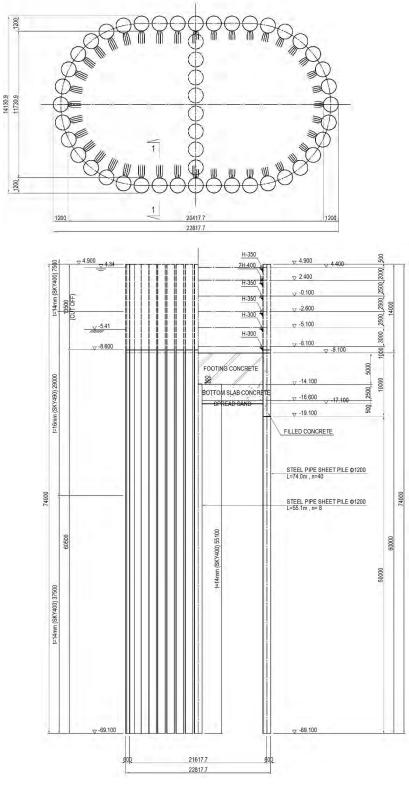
Dimensional Drawing of Foundation Shape
